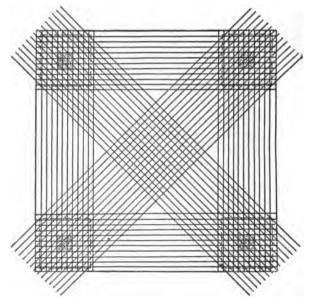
Showing Strips and Capitals of Columns in Girderless Floor.
